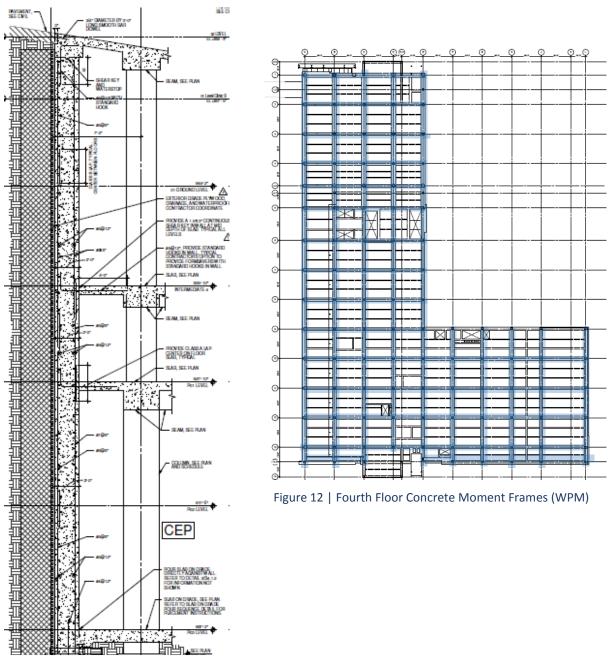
| Exterior Concrete Shear Wall Detail (WPM)
